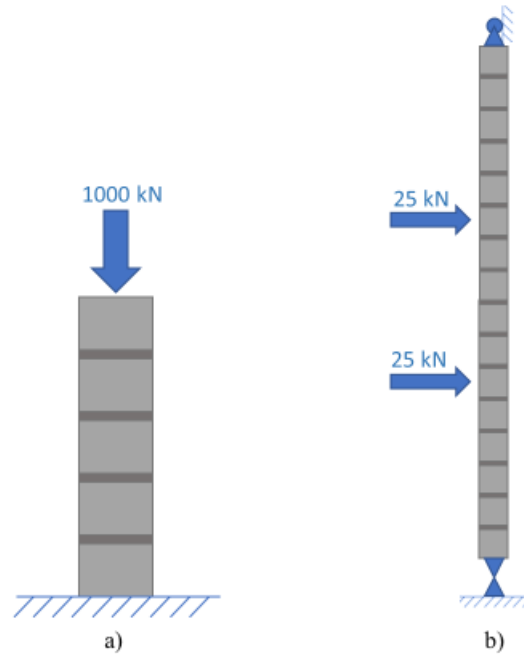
Conceptual loading conditions: a) masonry prism in uniaxial compression, and b) RM wall in 4-point out-of-plane loading
